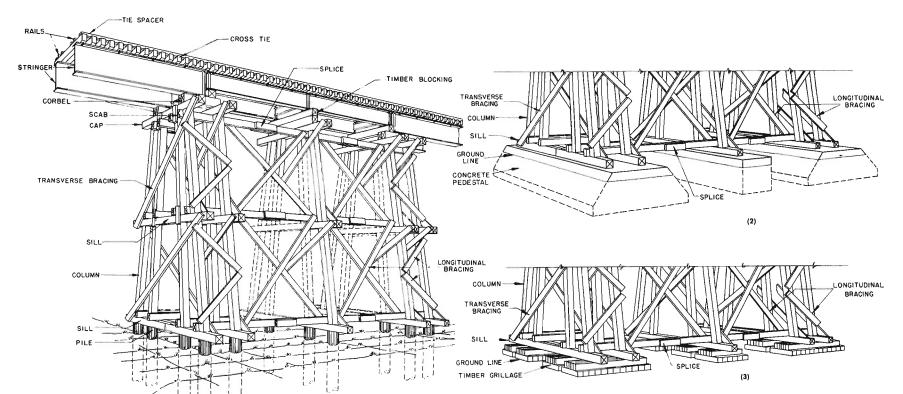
Railway bridge, steel stringer spans, framed timber tower.
